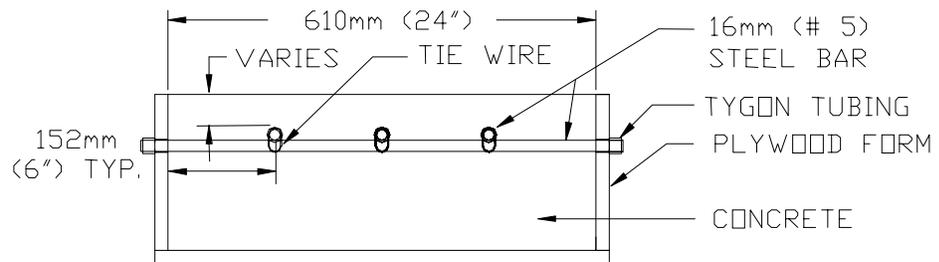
Form and Specimen Diagram for 610 mm (24 in.) Specimen Size
